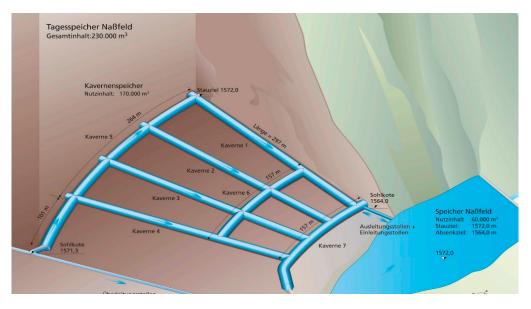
Planned cavern structure for the extension of the intra-day pumped-storage hydro power (UPSHP) plant Nassfeld, Austria [42].
